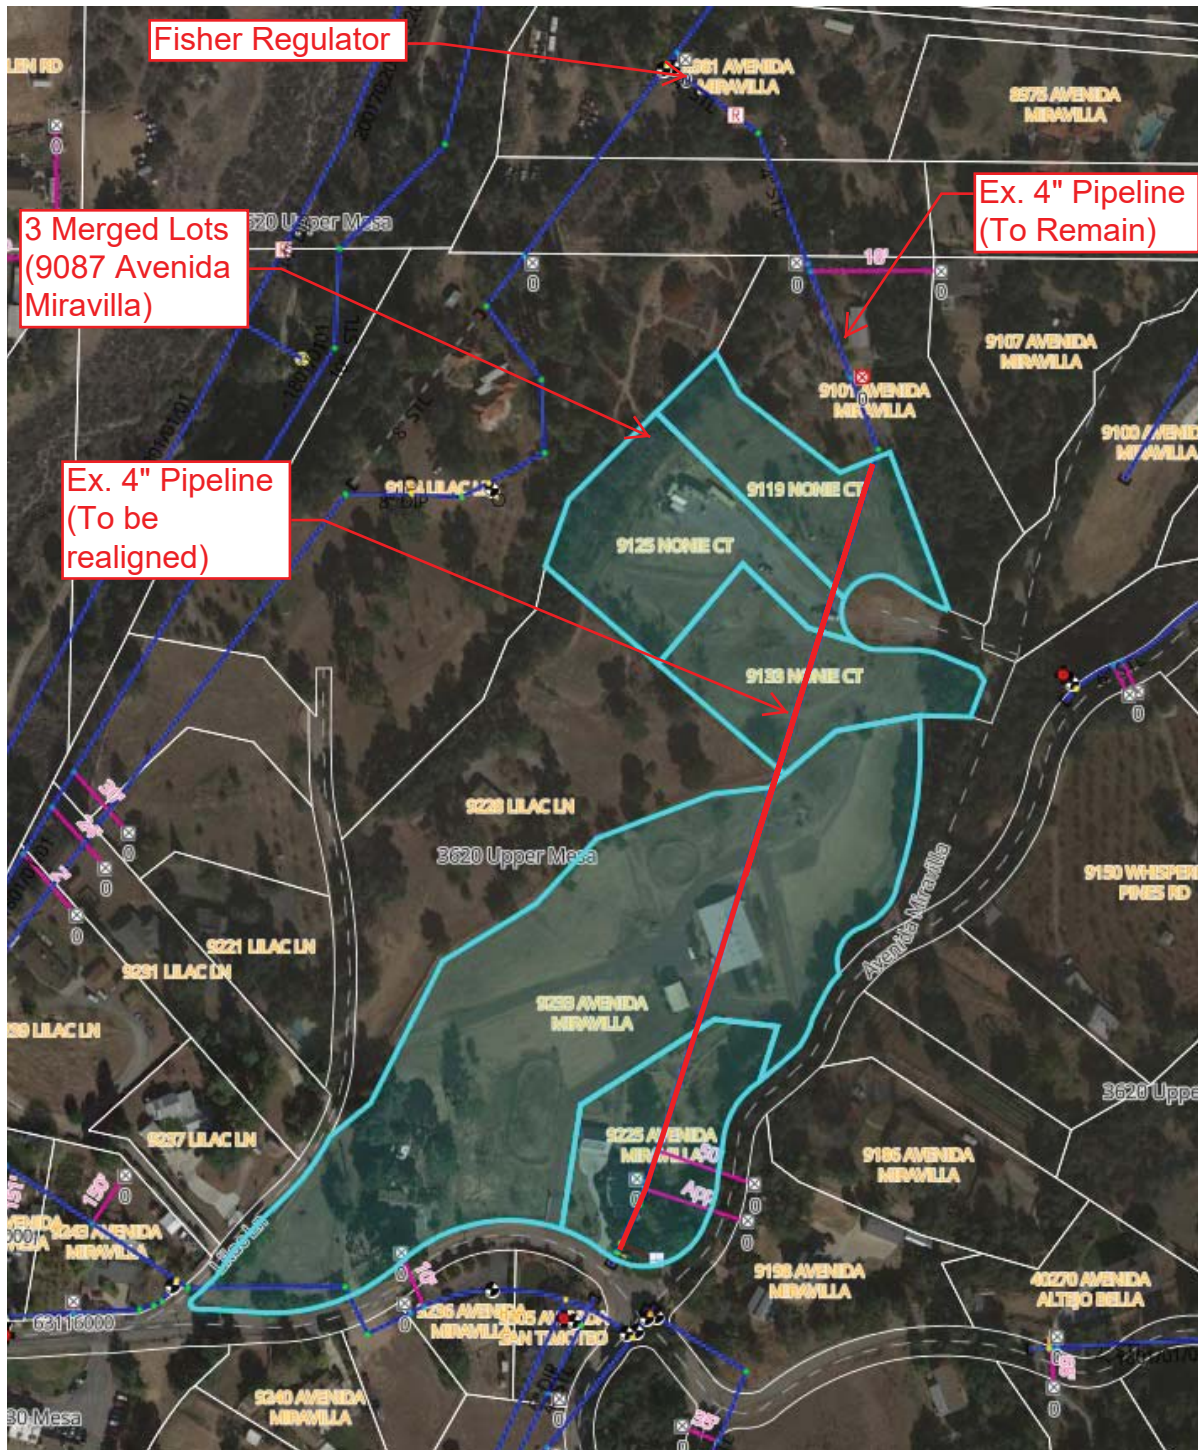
Preliminary 9087 Avenida Miravilla Water Realignment Plan
